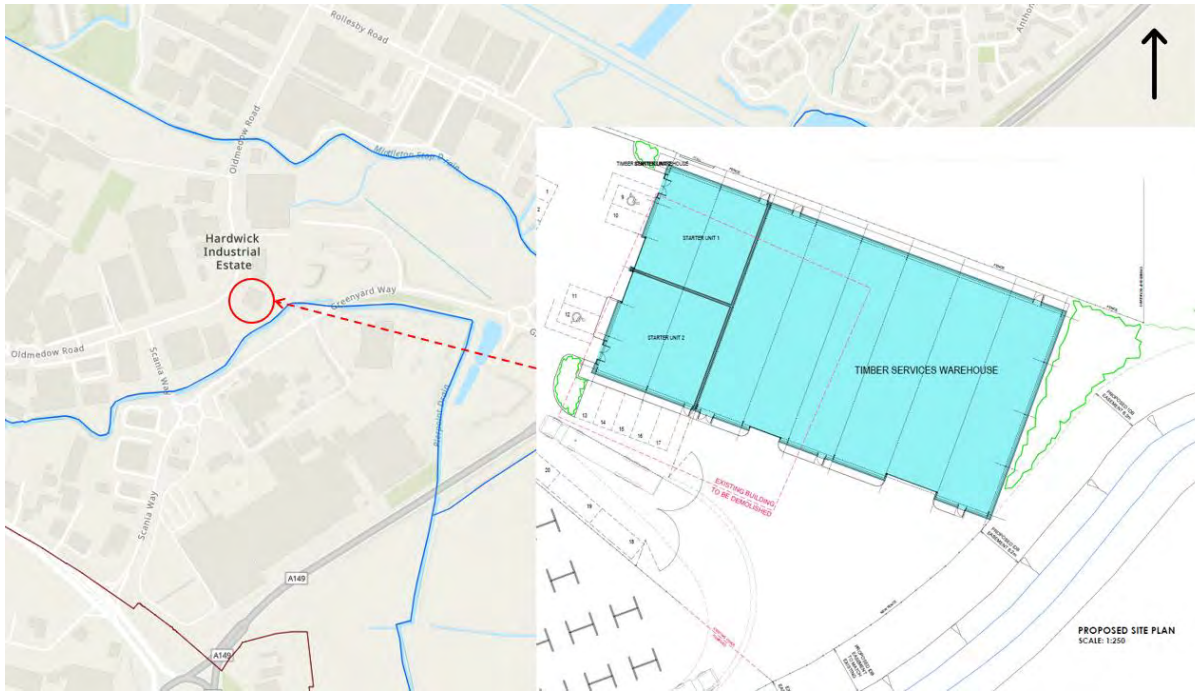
Site location and proposed site plan, showing the proposed warehouse, fencing and landscaping to be no closer than 6.2m from Pierpoint.
